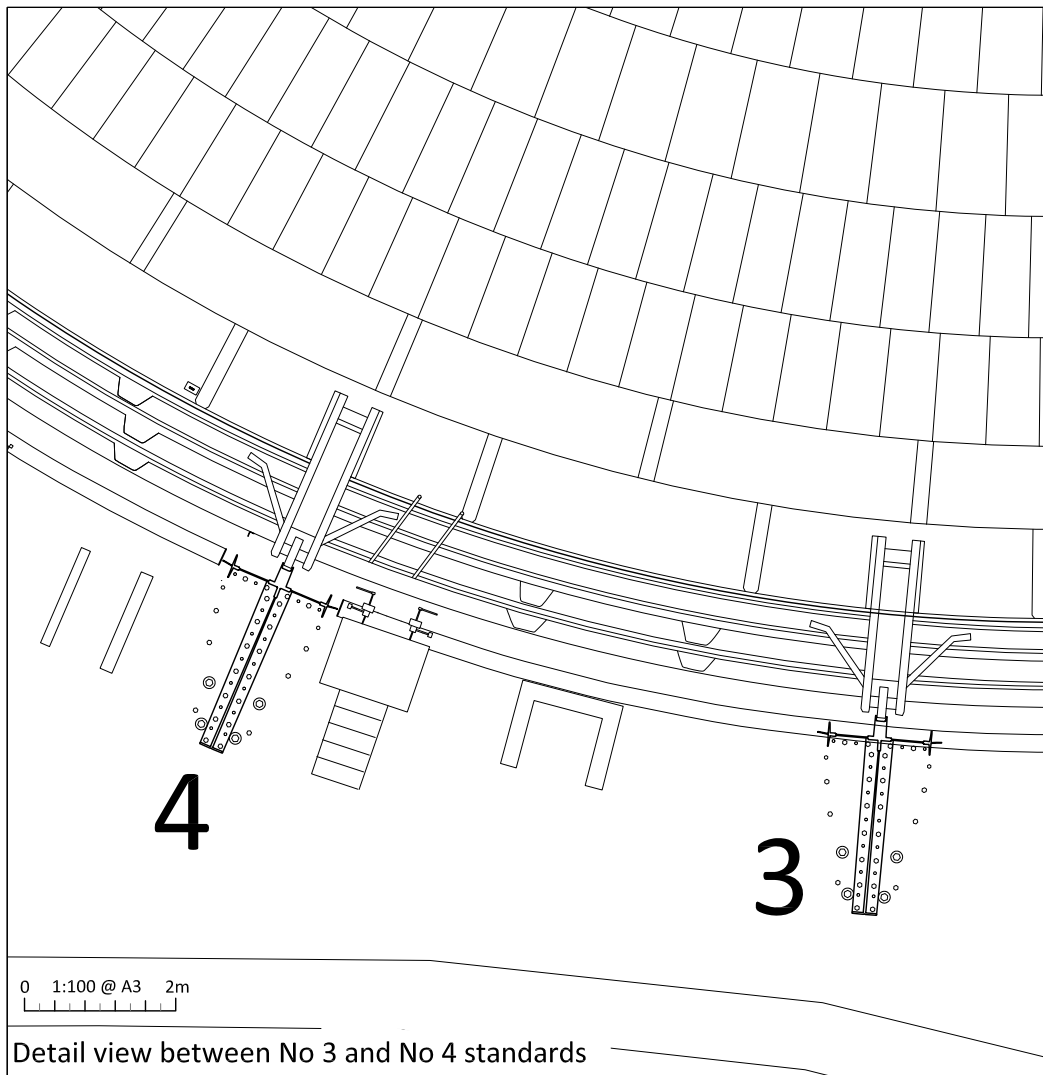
Bell Green, Sydenham, Gasholder No 8, detailed site plan
